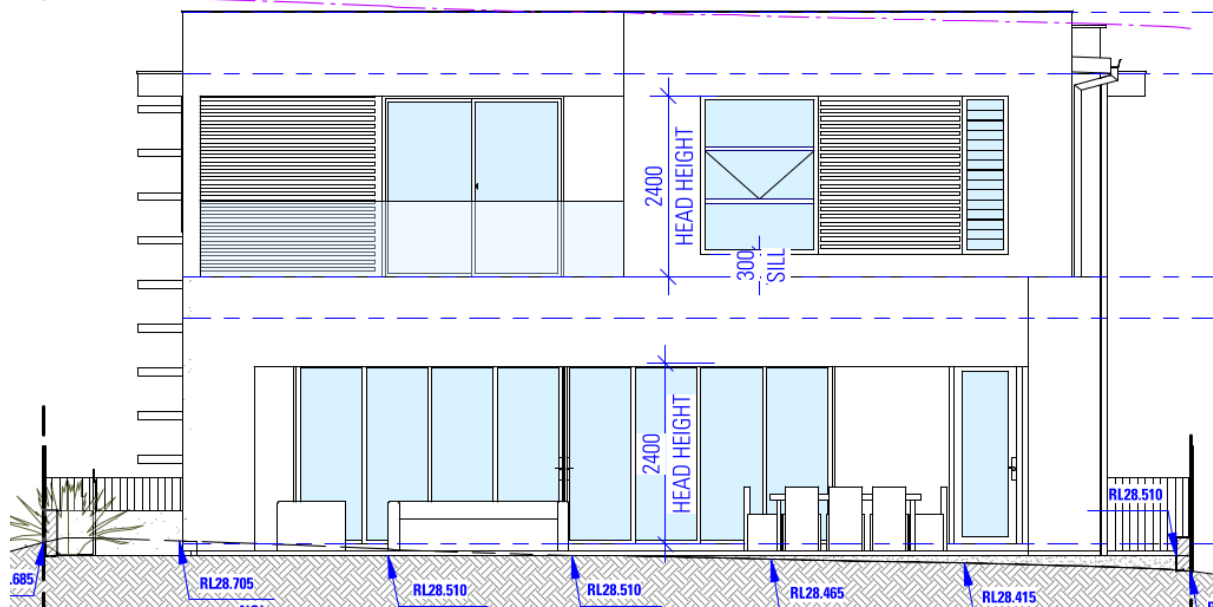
Extract of the eastern (rear) elevation of the proposed dwelling.
